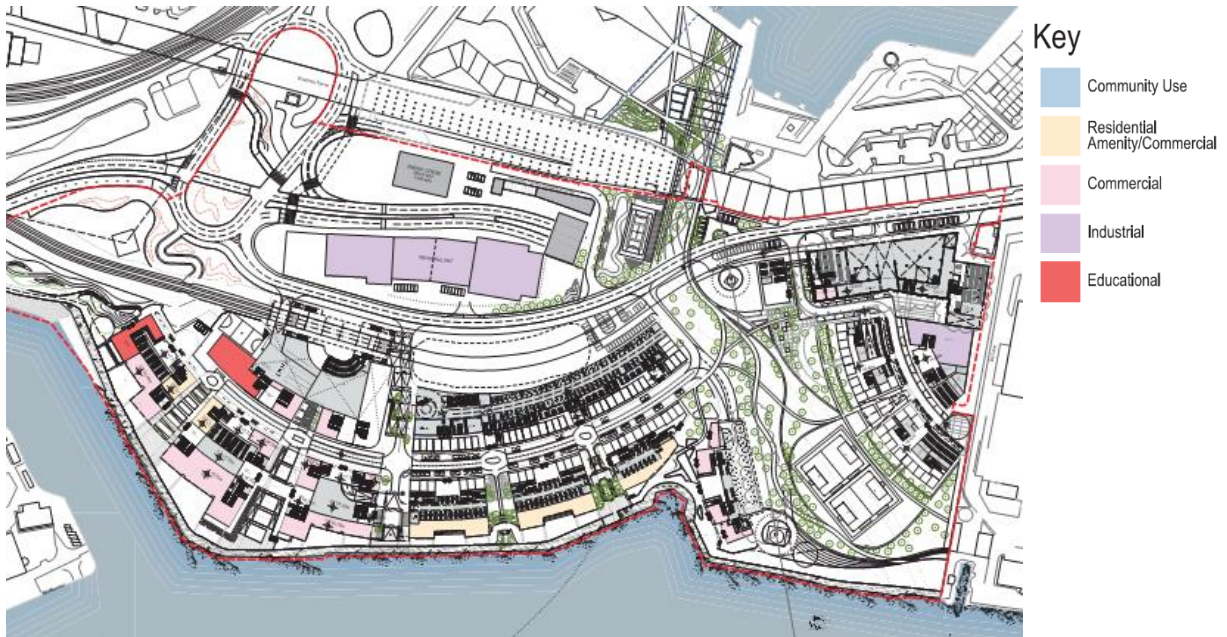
2 Ground floor layouts shows indicative locations and breathe of non-residential floor space
